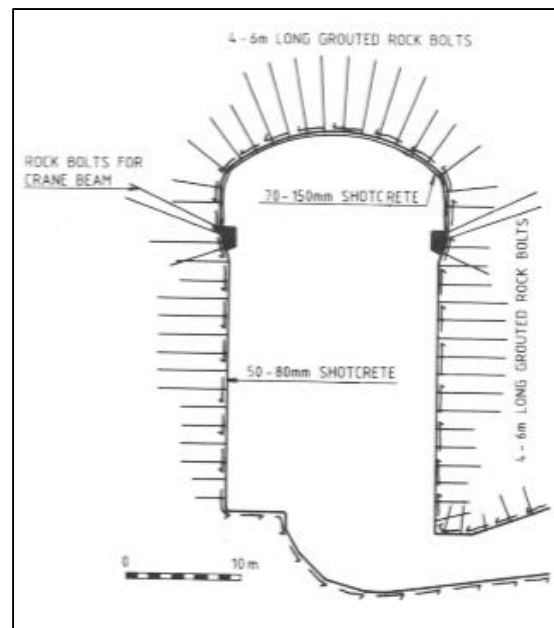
Rock support of cavern roof and walls, and rockbolted crane girders [22]
